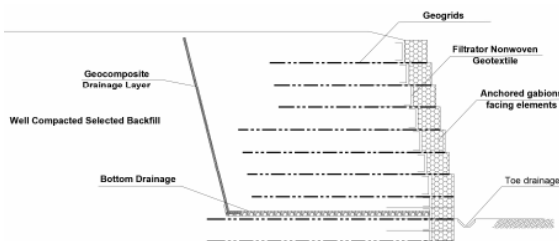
Typical section of a reinforced soil slope combining polymeric reinforcements (geogrids) and steel wire mesh reinforcements (anchored gabions and steel wrap around units)
